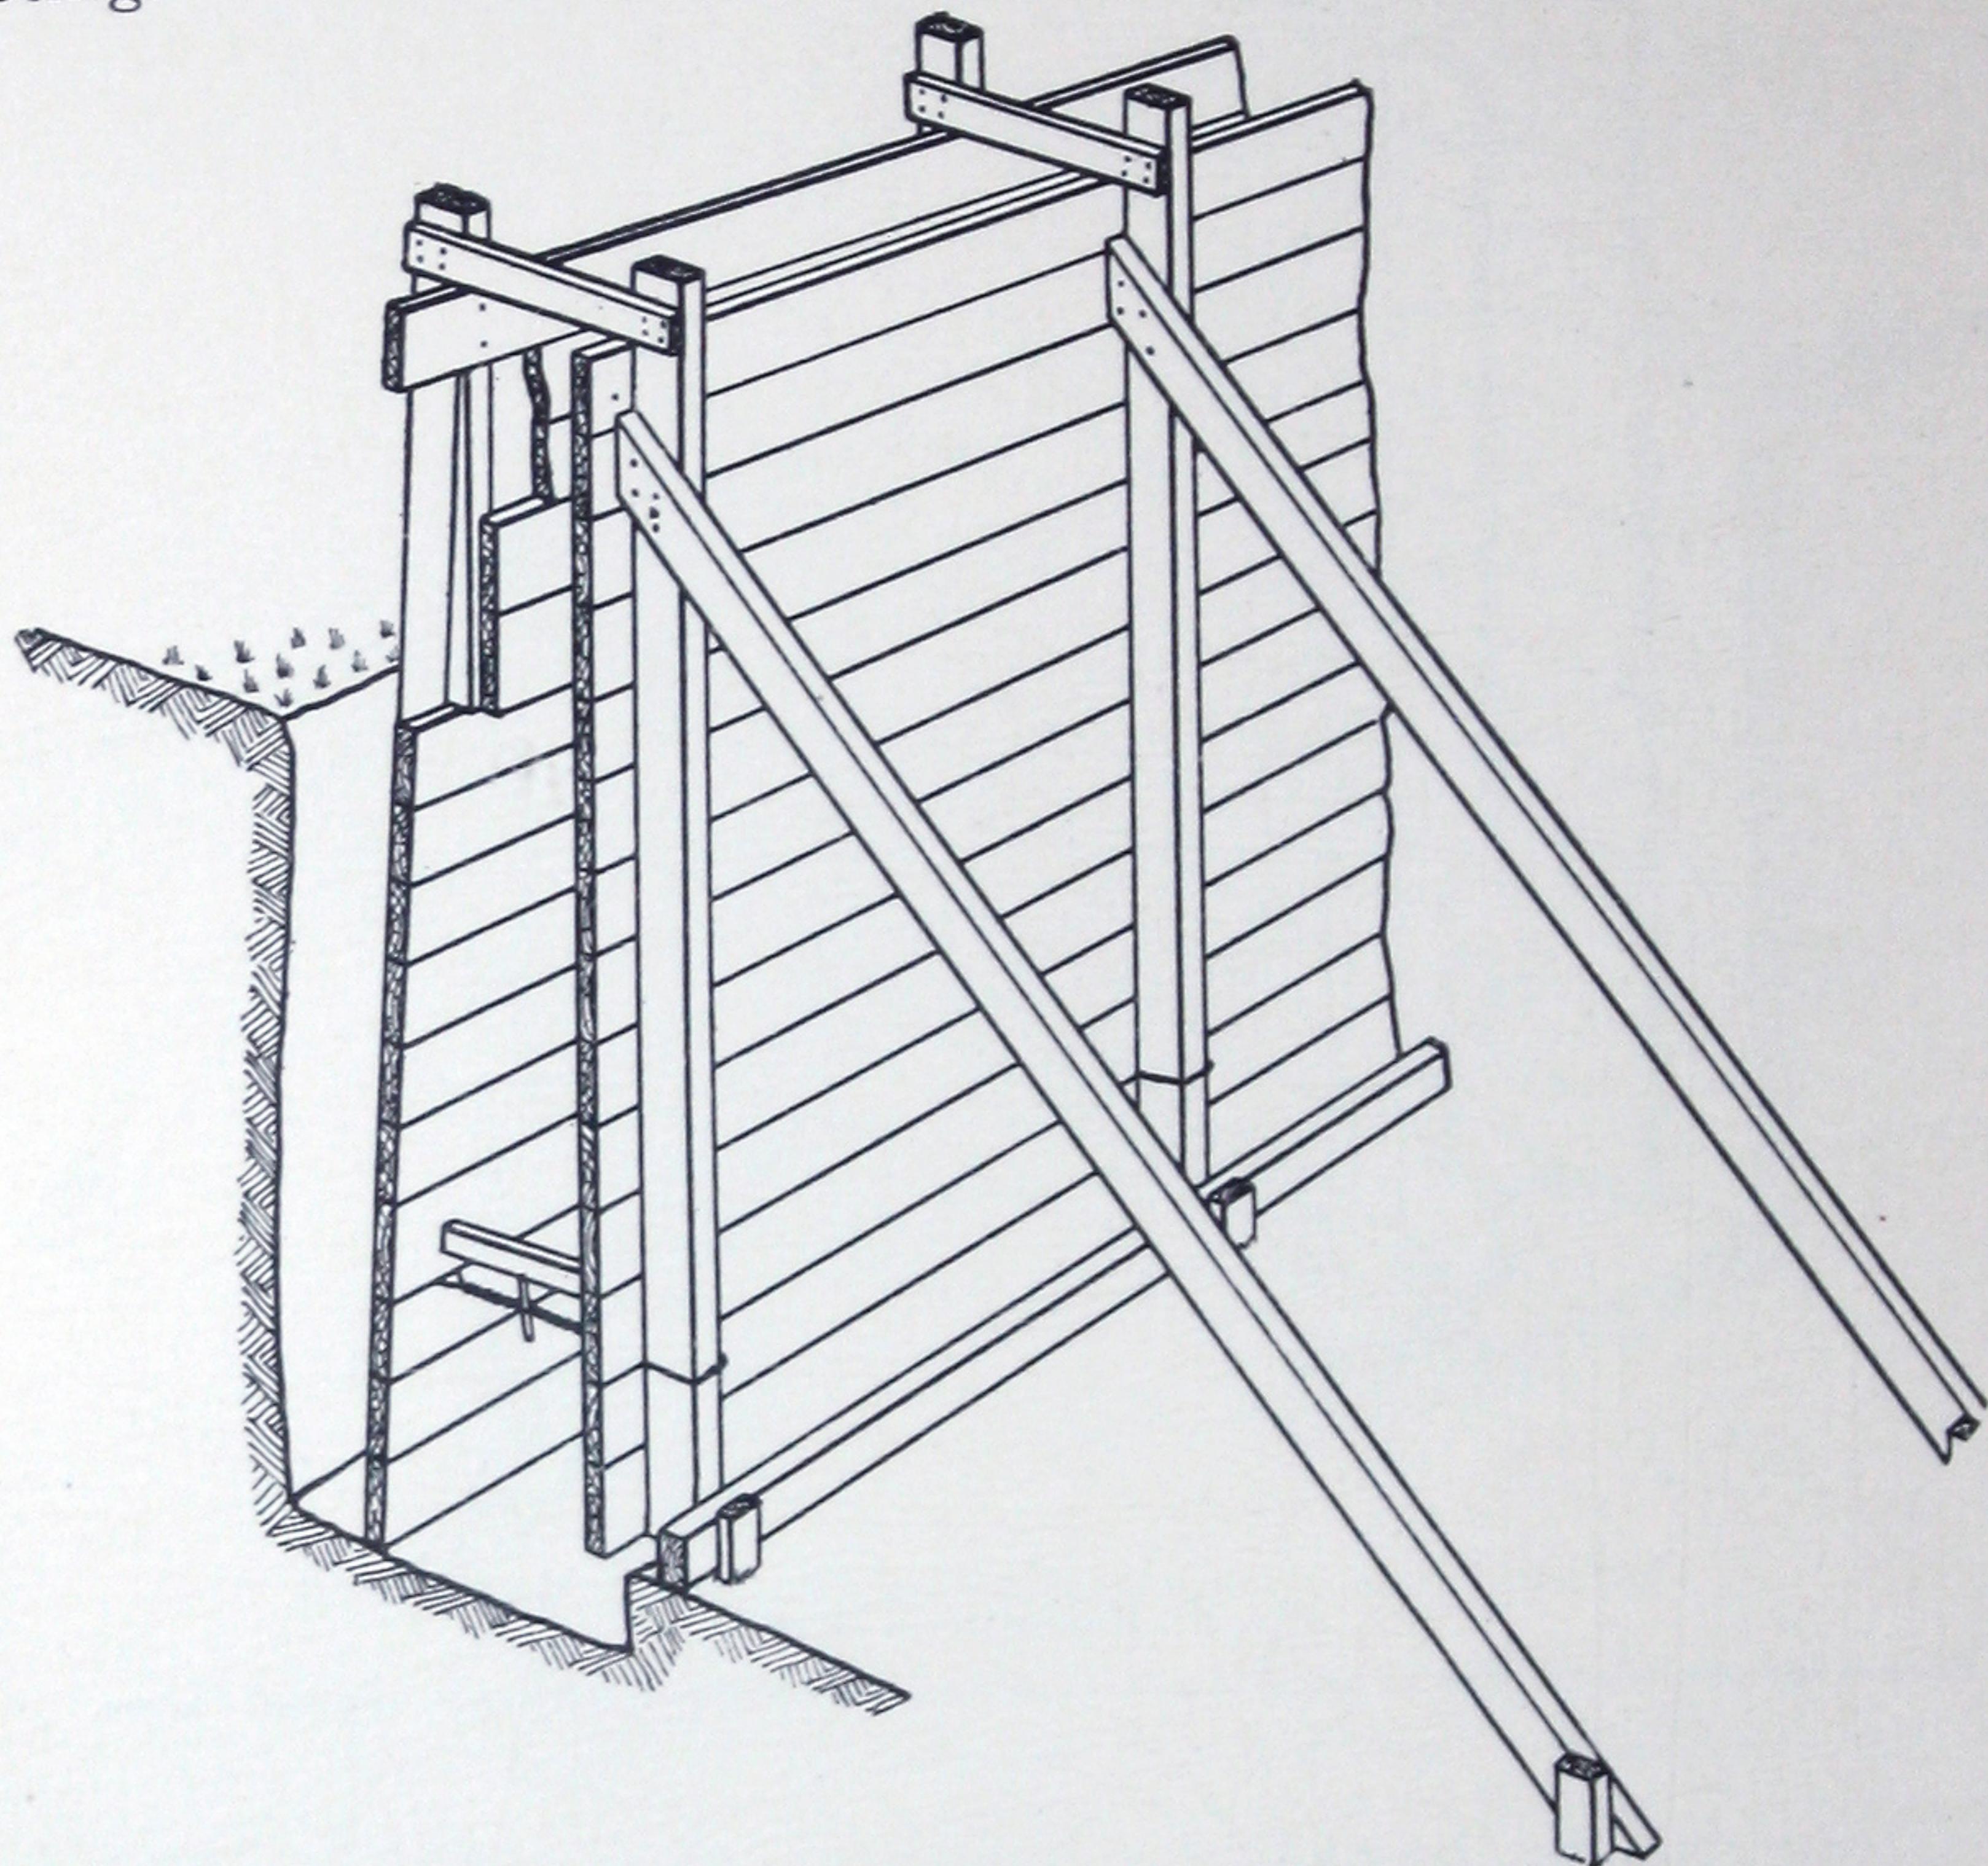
Foundation Wall. Forms showing inside form raised to provide a spread footing.
